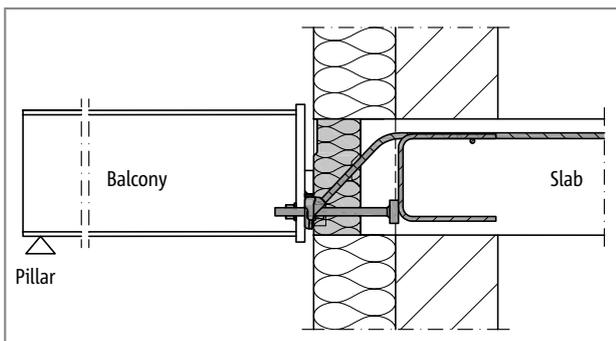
Isokorb® T type SQ: Using the ceiling floorion, the insulation body is flush with the insulation of the wall on the outside. The lateral edge distances must be taken into account.
